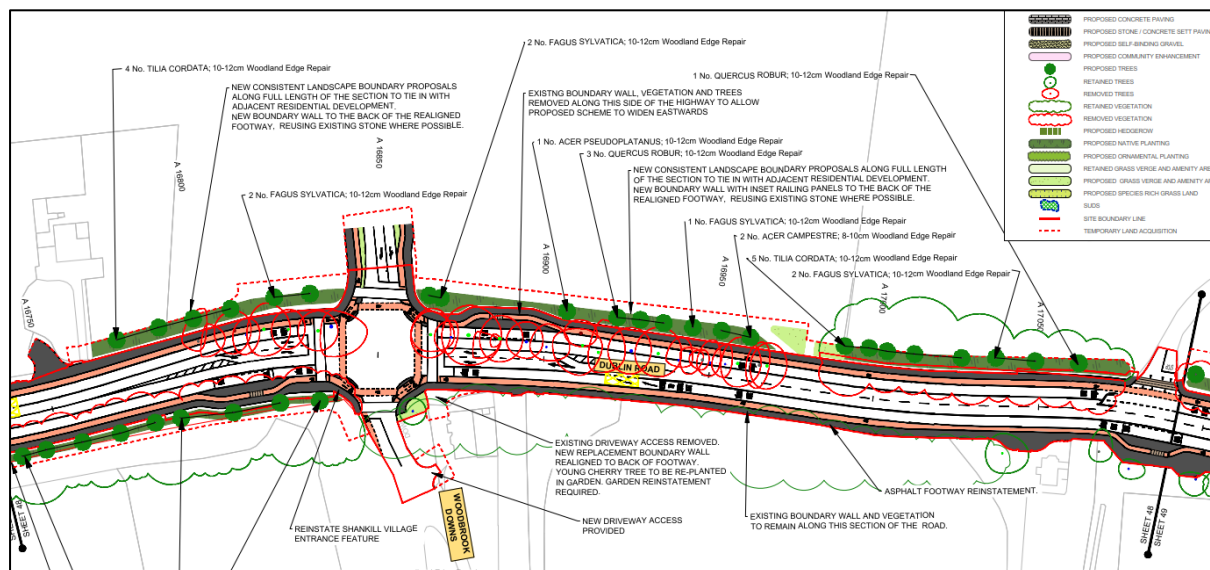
Extract from Landscape Drawings at Woodbrook SHD (Sheet 48)
